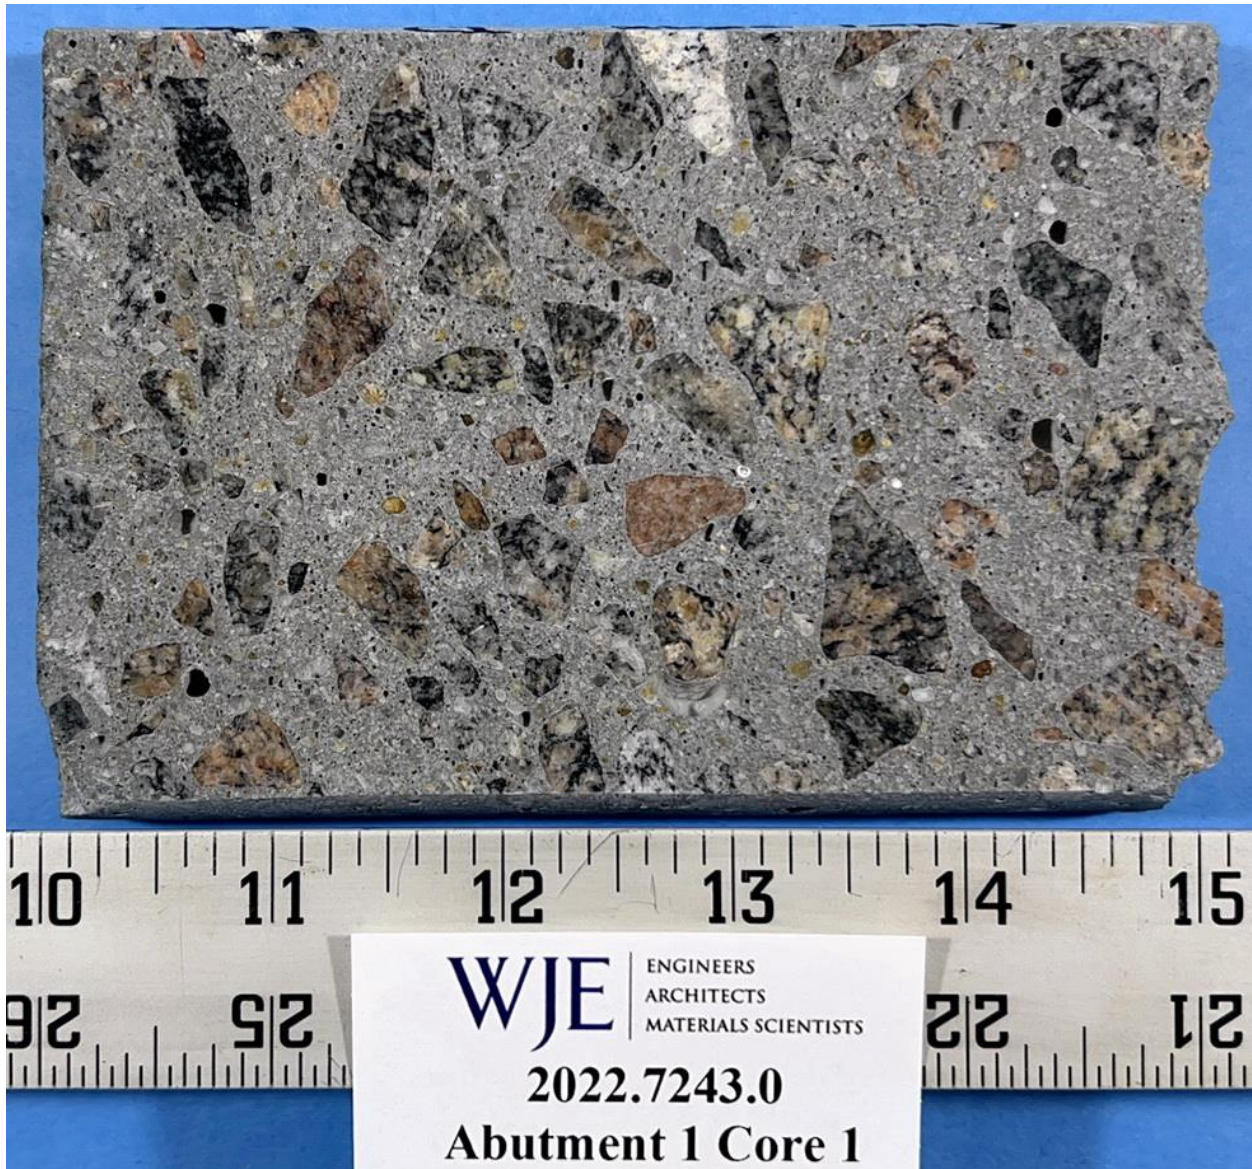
Core 1. Lapped cross section, with the exterior surface facing left.
